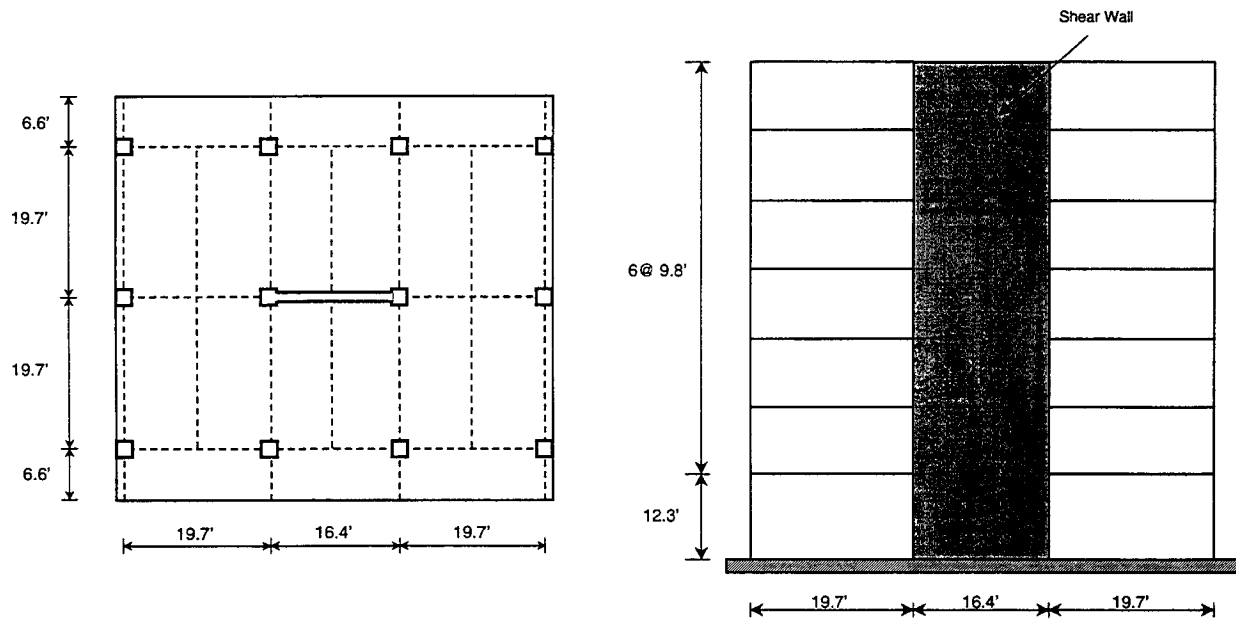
(b). Plan and elevation of Study Structure 2: dual system
